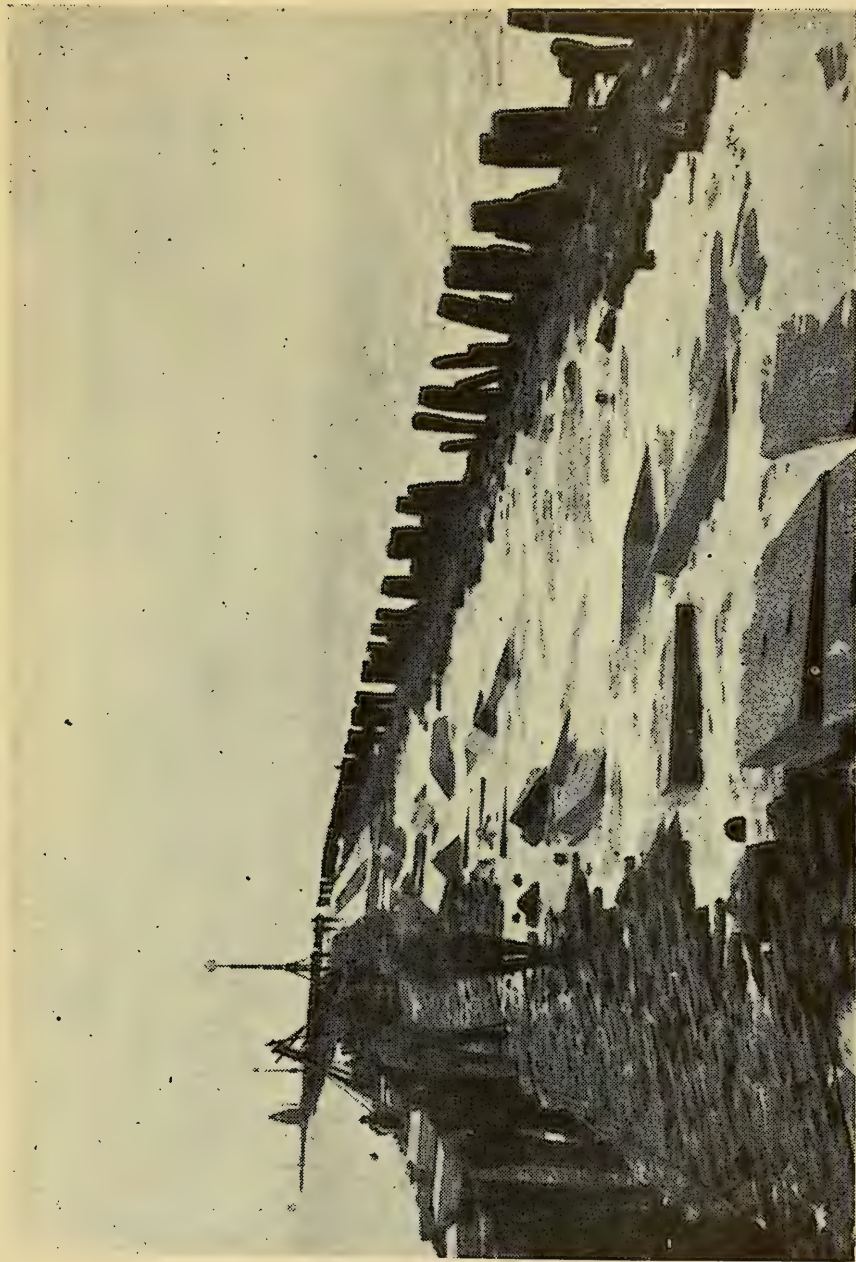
North pier, Hook of Holland. Damage caused by a gale in September 1948 to a section of the track which was completed, but where the asphalt grouting had not been applied. In the background the track is undamaged where provided with asphalt grouting.
